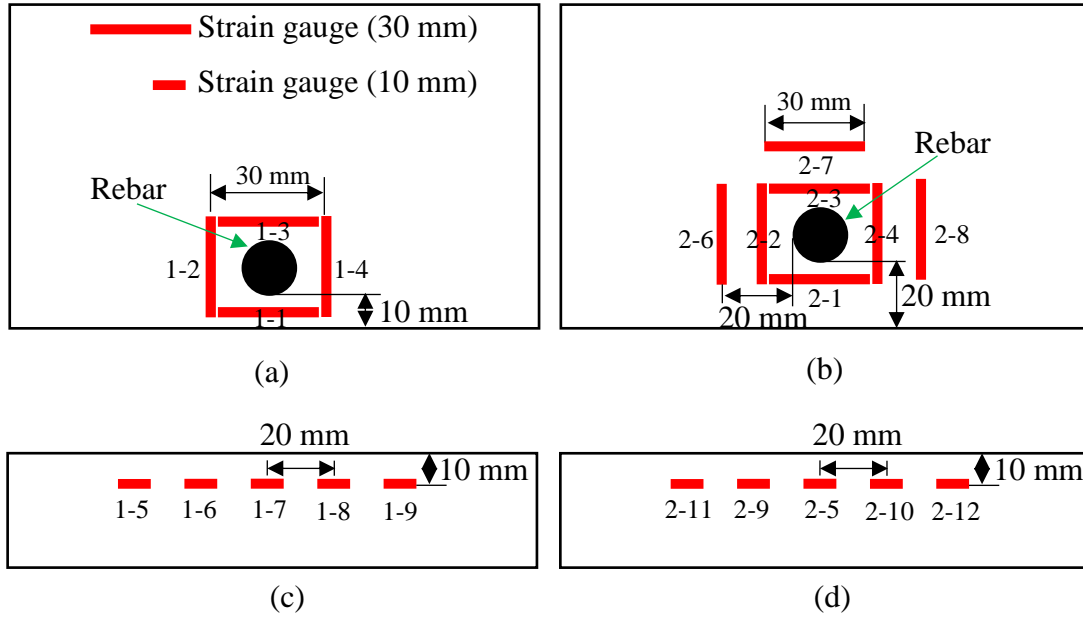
Layout of strain gauges (a) front view of Specimen 1, (b) front view of Specimen 2, (c) cover surface of Specimen 1, and (d) cover surface of Specimen 2
